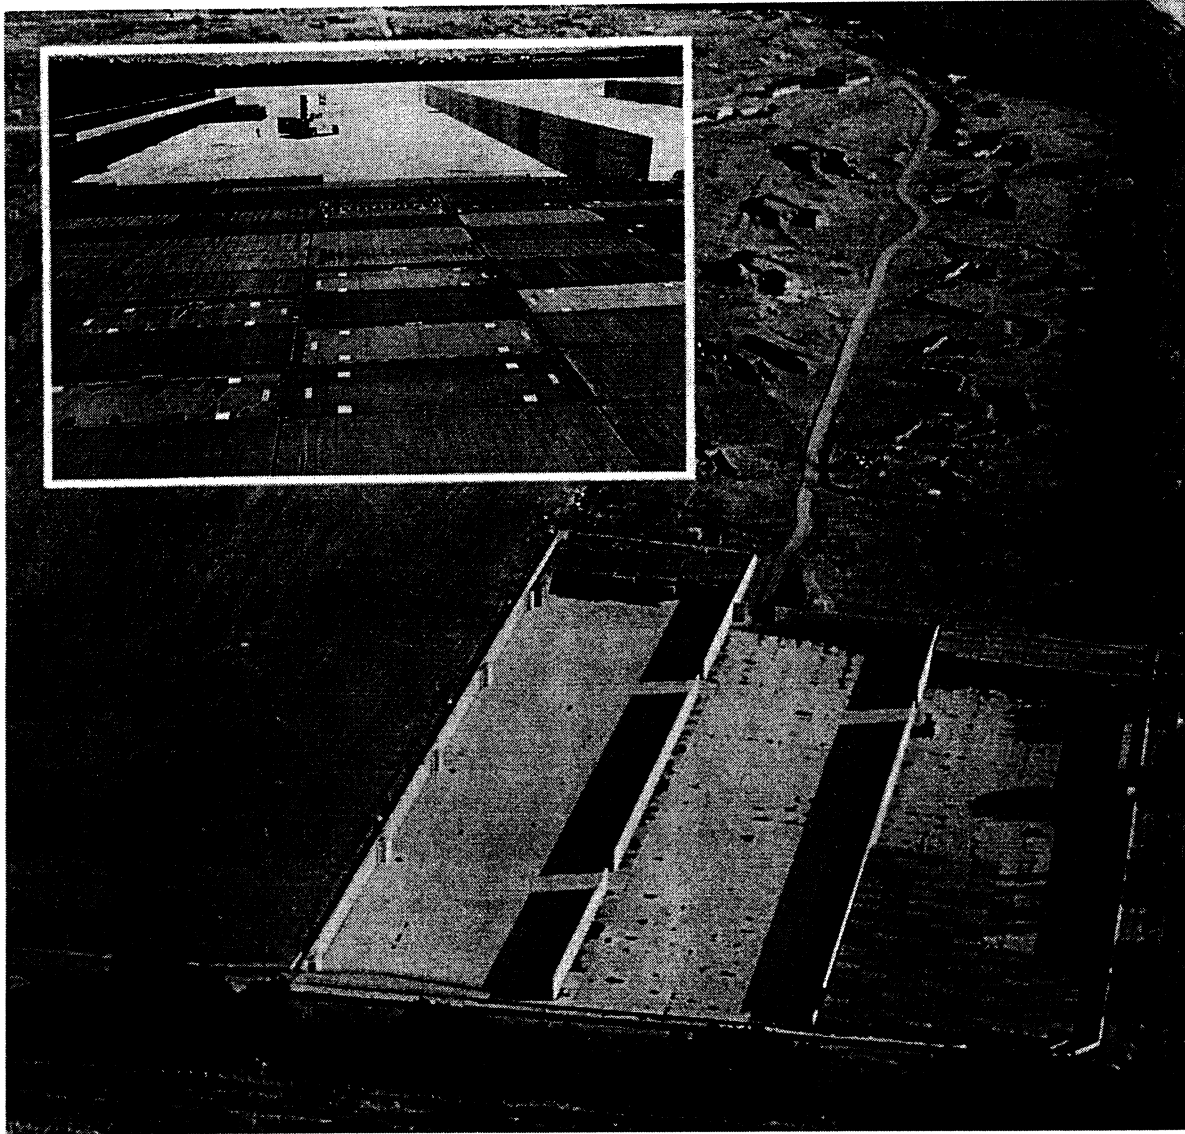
An aerial view of BNFL's low-level radioactive waste disposal facility at Drigg in north west England (CEC 1994). The bottom right-hand part of the main picture shows the concrete vault (known as Vault 8) which is divided into three sections by concrete walls. Super-compacted waste is loaded into steel ISO containers which are then filled with a fluid cement grout. Waste containers can be seen partially filling each of the vault sections. The inset gives a more detailed view of the tops of emplaced waste containers within the vault, and the emplacement method using a conventional fork-lift.
